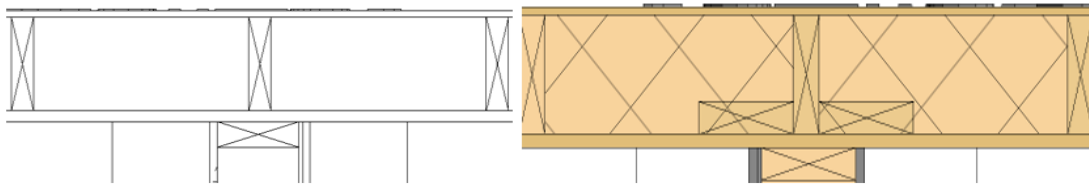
Framing around T-connection with a conflict of stud spacing
